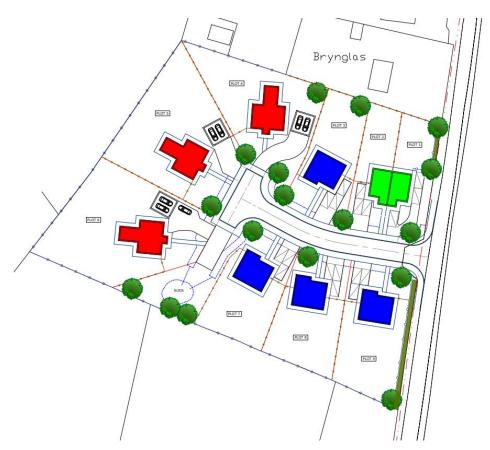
Proposed Indicative Site Layout Plan for Representation Site
